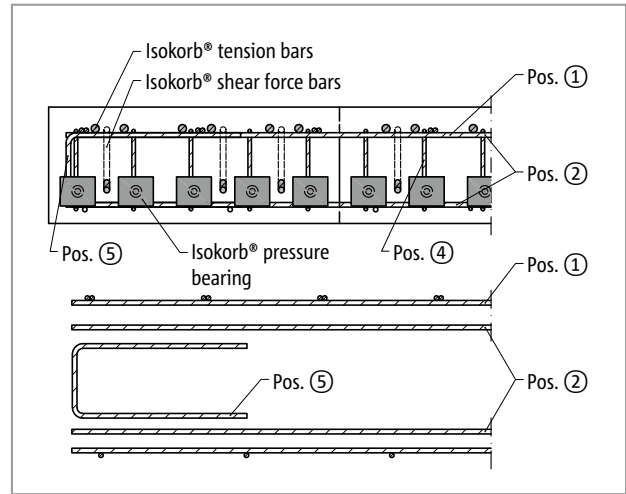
Schöck Isokorb® XT type K-M11: On-site reinforcement balcony side in section A-A; Pos. 5 = side reinforcement on the free edge perpendicular to the Schöck Isokorb
